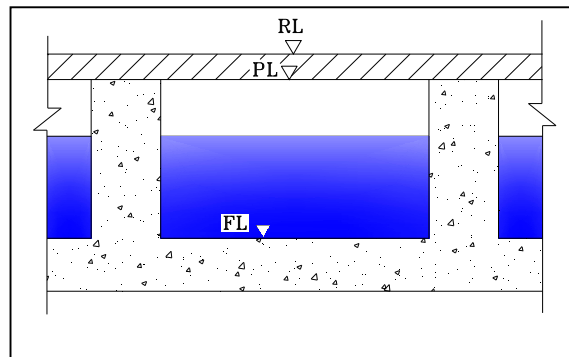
Cross section of bridge type No.2 (Slab Bridge)
